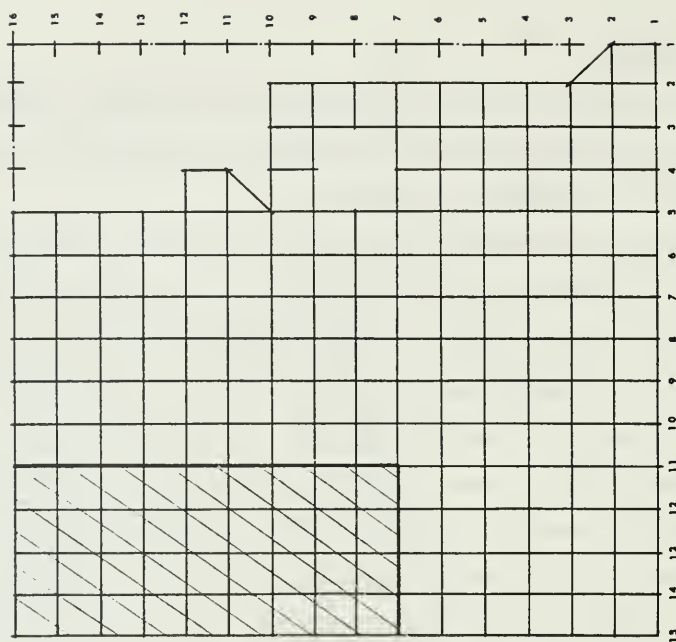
B ELEVATION VIEW OF PIER ELEMENTS
